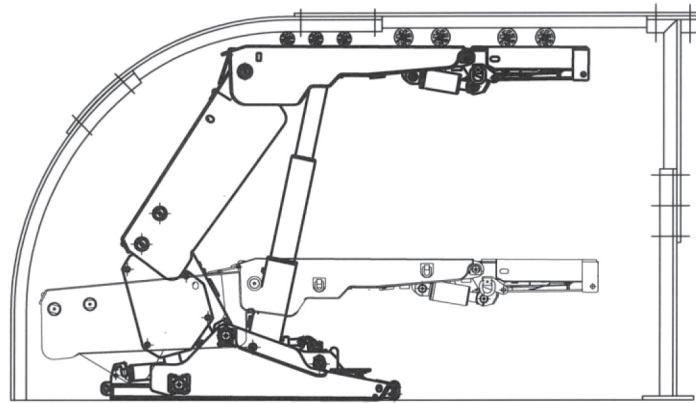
ŁPro/B frame variant I with an installed powered support unit (unit before and after spragging)
